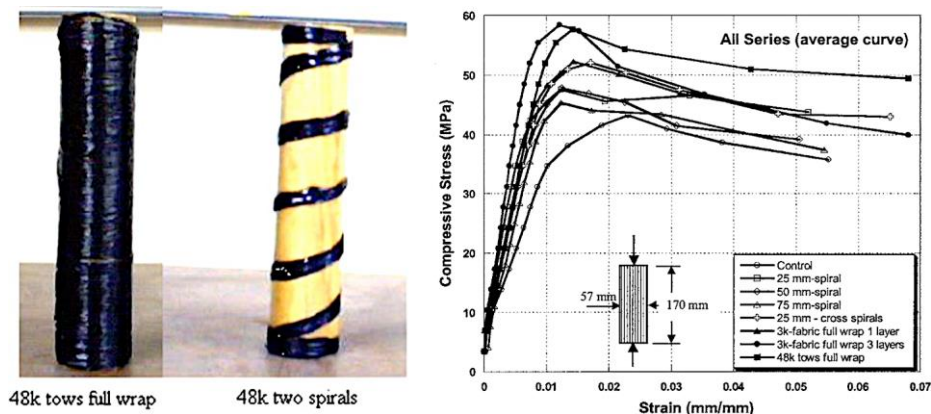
Typical column specimens and average stress-strain behaviour from a study by (Najm et al. 2007).
